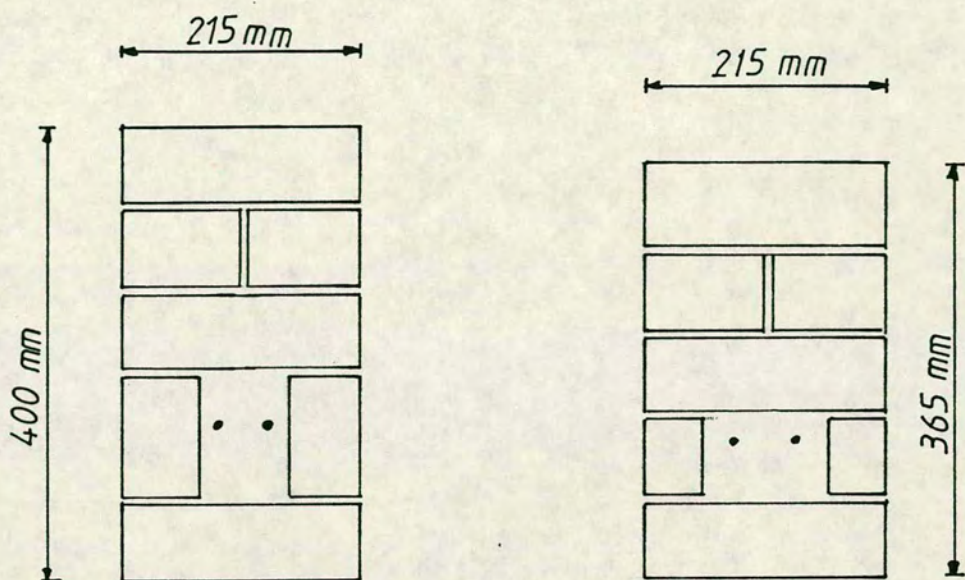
Beam Sections of PEDRESCHI⁽¹¹⁾
